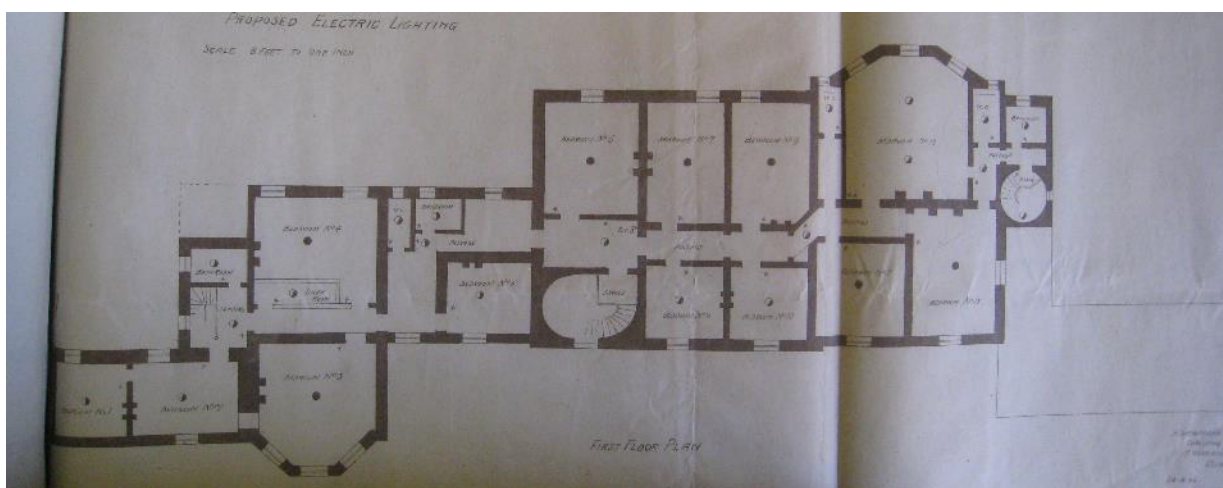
1906 Proposed electric lighting, first floor plan. The former conservatory to the east aisle was 1 storey. Source: 1906 Proposed electric lighting S. Geoghegan.
